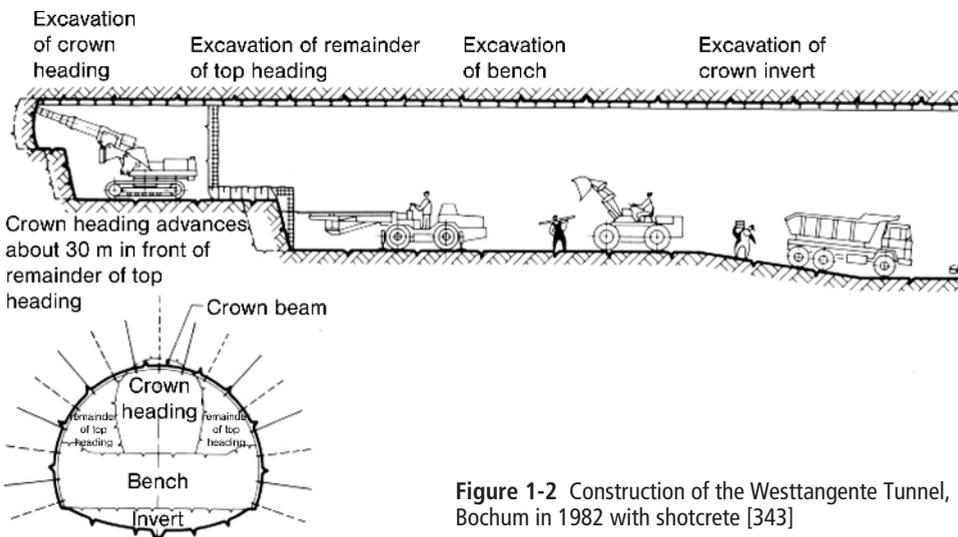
Construction of the Westtangente Tunnel, Bochum in 1982 with shotcrete [343]
